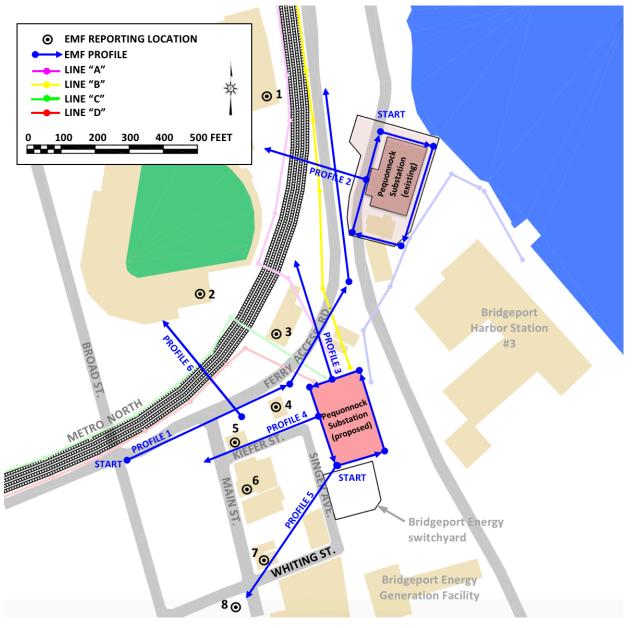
Plan view of the Project vicinity, showing existing and proposed substation yards and the location of calculated profiles.
